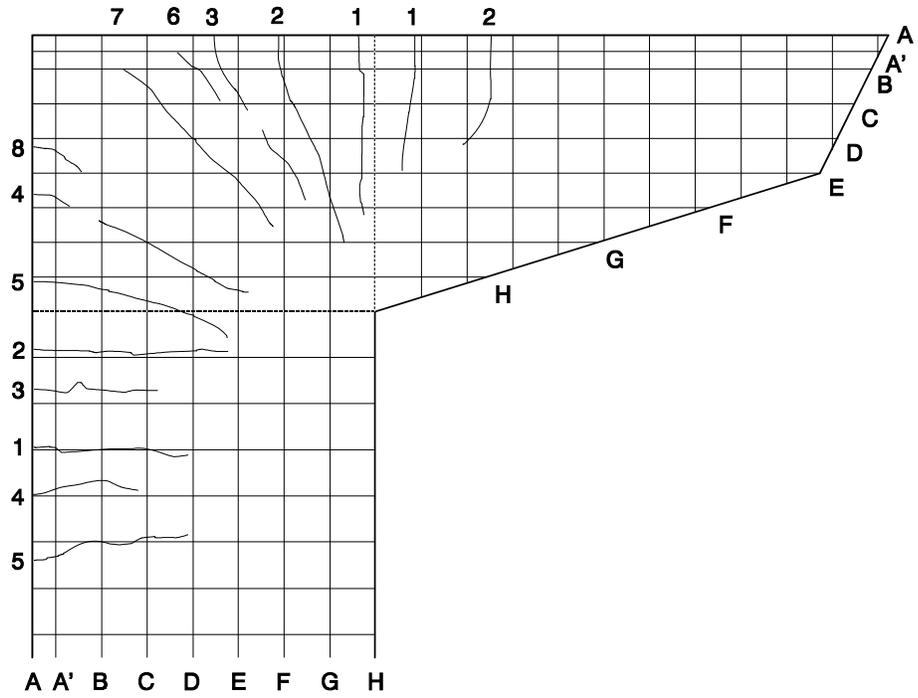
POJ-RC-100-TH cracking pattern on north face of specimen at dead load
